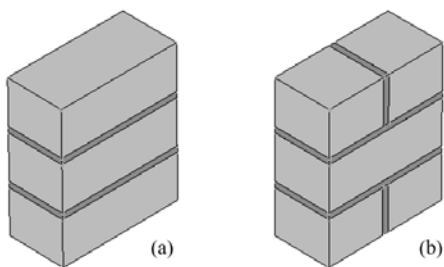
Specimen geometry: (a) standard triplet specimen (stacked bond); (b) modified triplet specimen (running bond).
